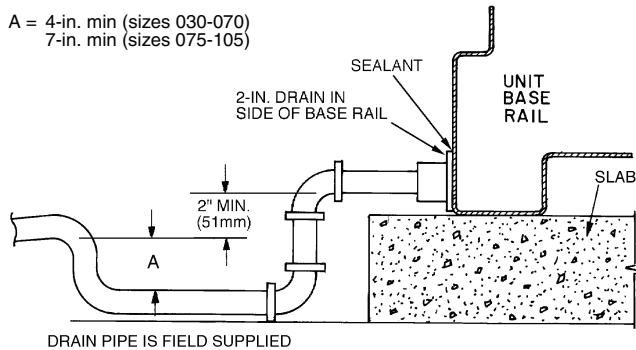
Slab-Mounted Condensate Drain Piping Details
